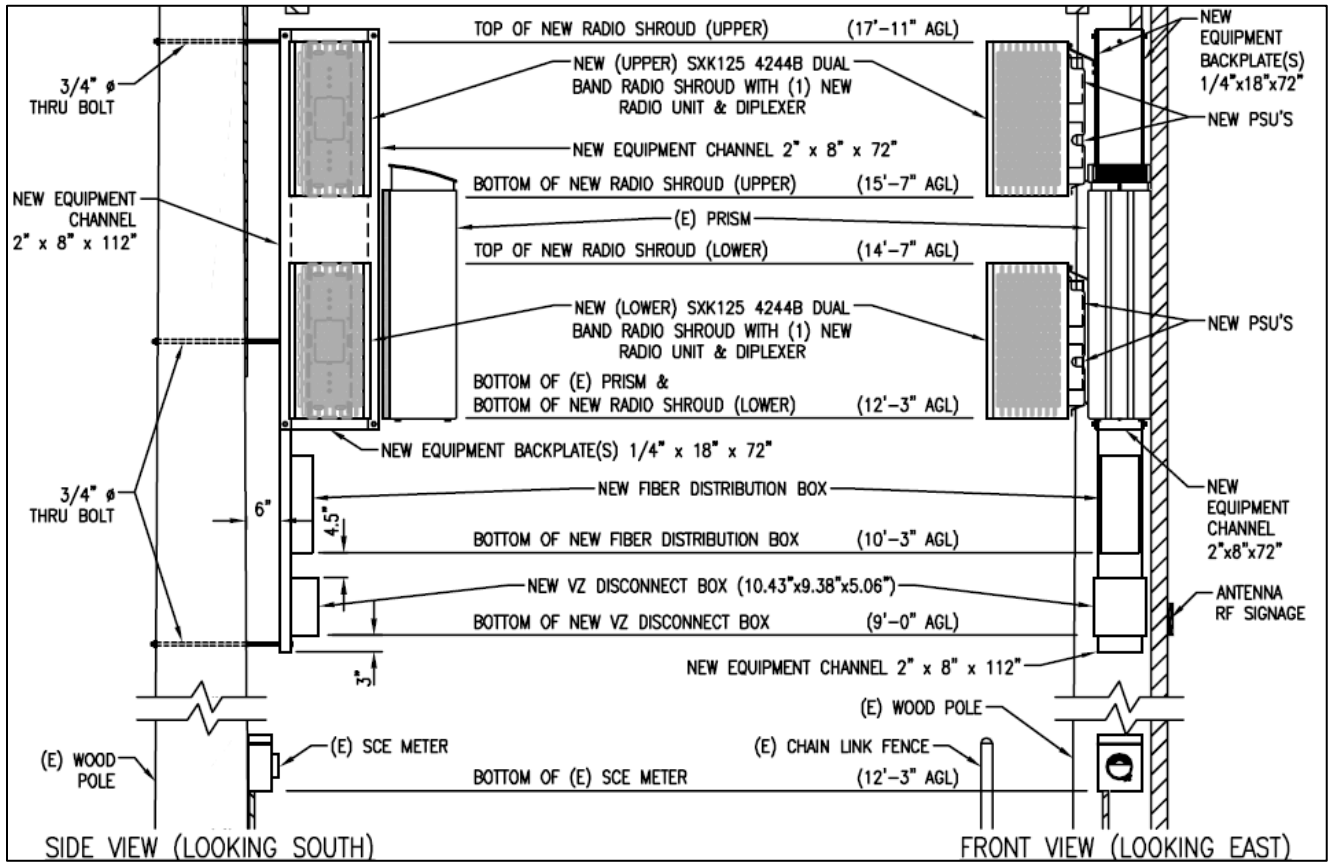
Expanded view of Verizon’s associated equipment mounting detail. (Source: Plans, page D-1, panel 8).
